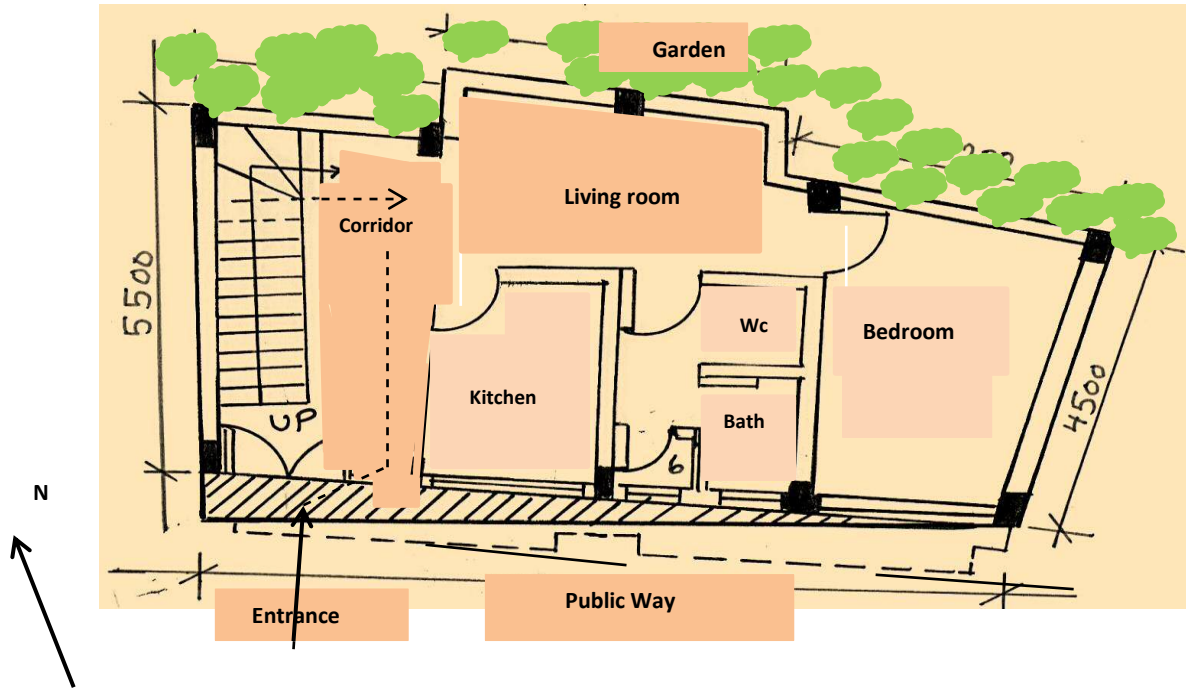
Ground floor level plan of modern house No. 5. Scale: 1:100 (Researcher)
